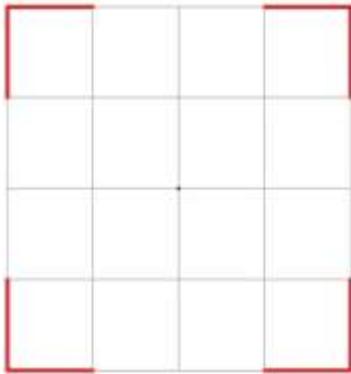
(a) Structural Plan for X-braced RC Frame (Model-3)
